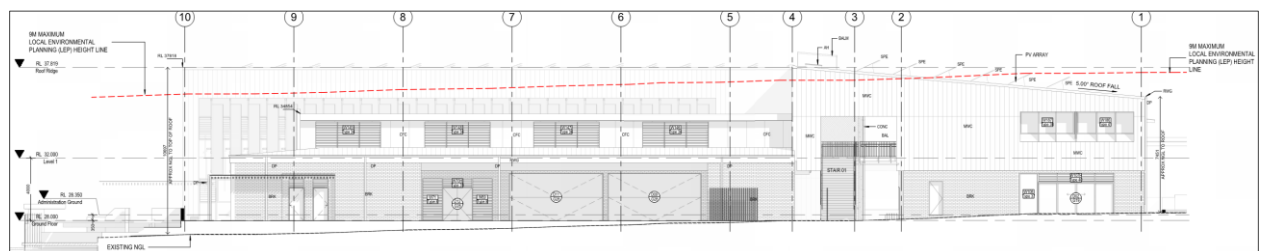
Proposed west elevation of the new school building. (Source: Conrad Gargett)
